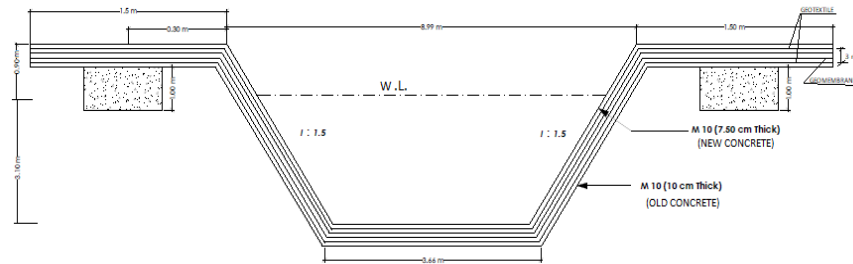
CROSS SECTION DUDHGANGA RIGHT B BANK CANAL @ 5.50 Km.
